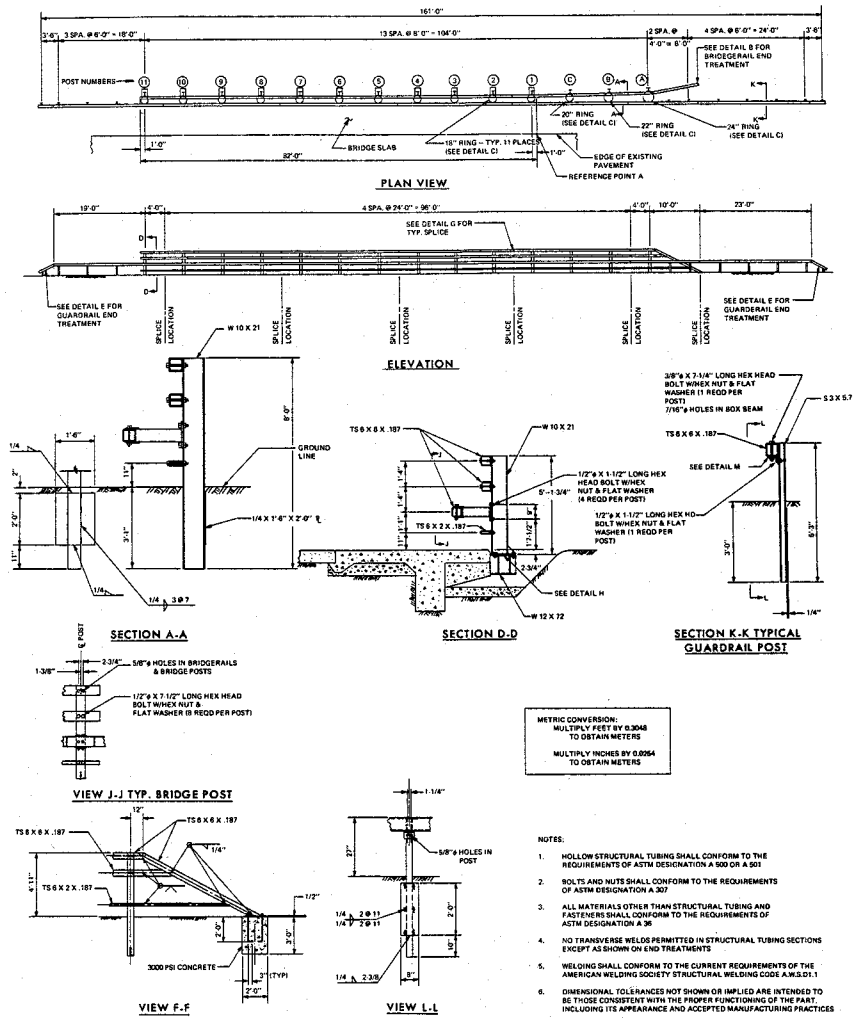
COLLAPSING RING BRIDGERAIL SYSTEM
